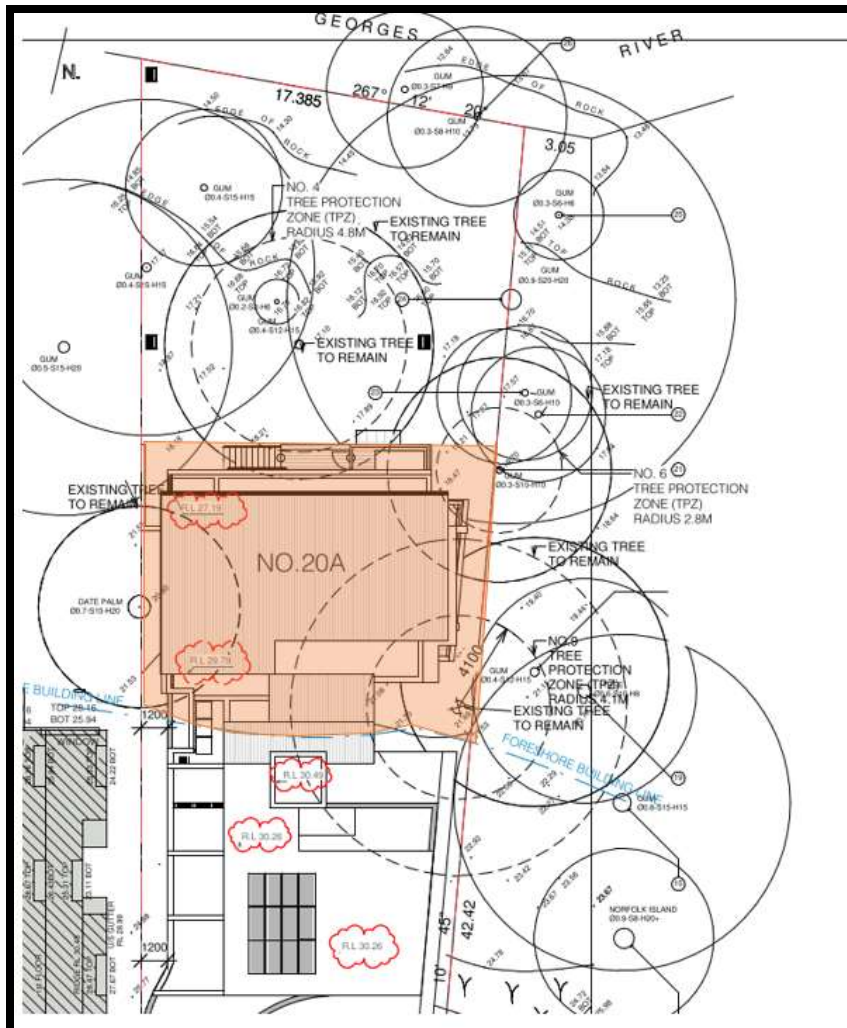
Site Plan showing the extent of the encroachment beyond the 30m FBL
